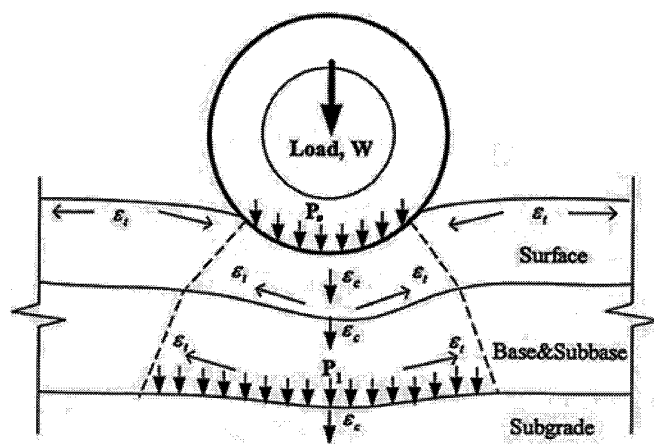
Flexible Pavement Structural Deformation and Loading Distribution.
